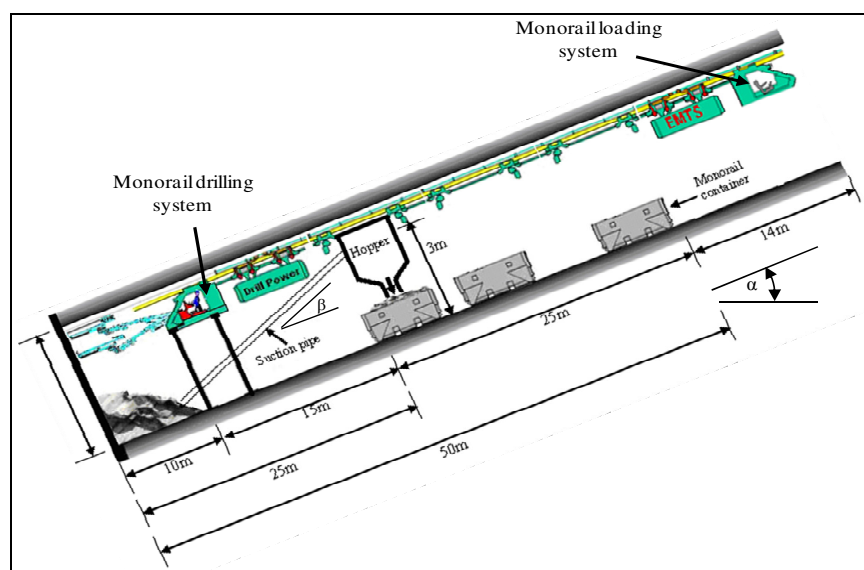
Conceptual monorail drilling and loading system (Chanda and Besa, 2009)
